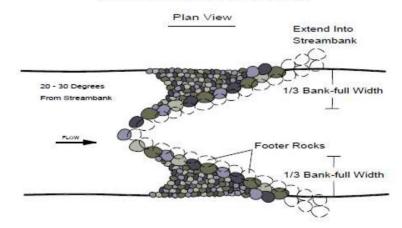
Plan view of rock cross vane. Cronauer 2016.
